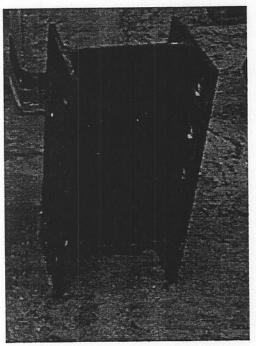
Separation of the pile/seal slab interface after failure for a steel specimen.
